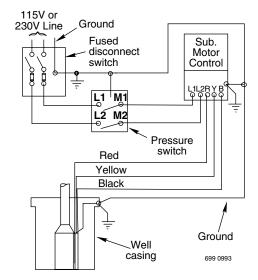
A - 3 wire - 1/2 thru 1 HP submersible motor control.
